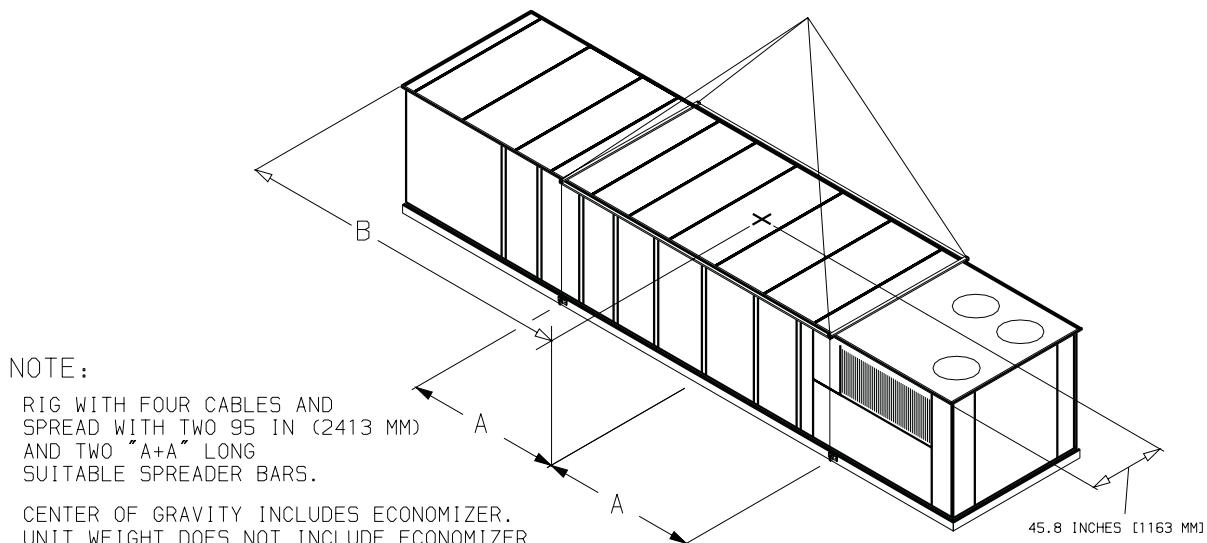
Rigging Label — Size 030-050 Units (Standard Chassis)
